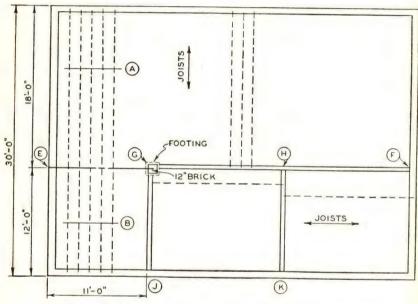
Plan for Basement Showing Necessity for Brick Column Footing
